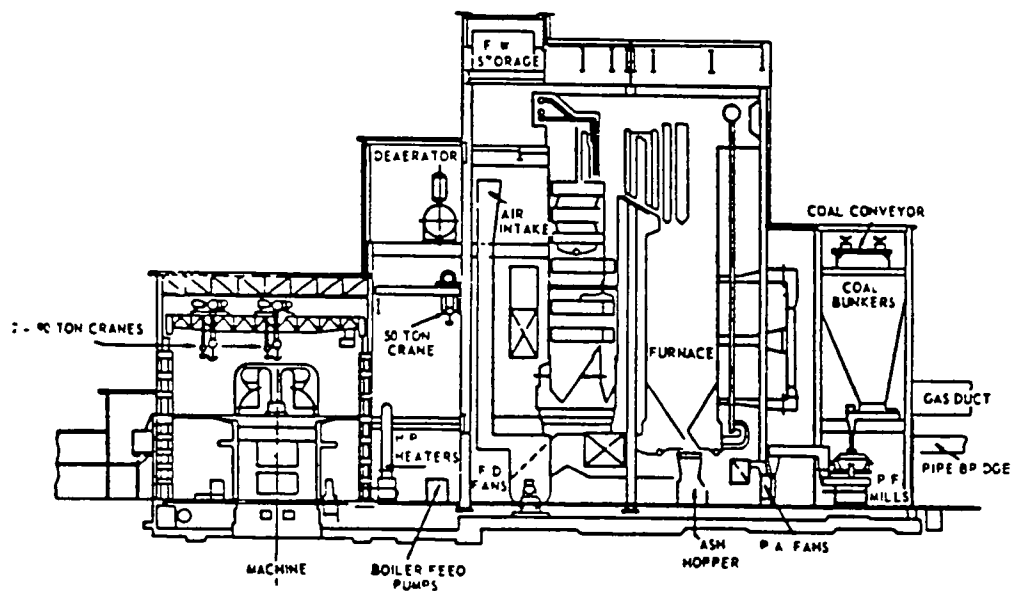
Typical cross section of power hall and boiler house (CEGB 1971, 68)
